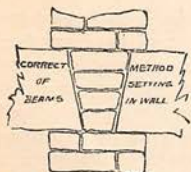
PROPER METHOD OF RESTING BEAMS ON WALLS.
